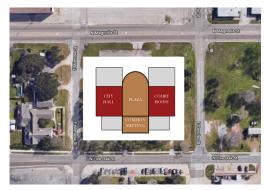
Downtown Anchor Project Layout Source: www.virtualbx.com
